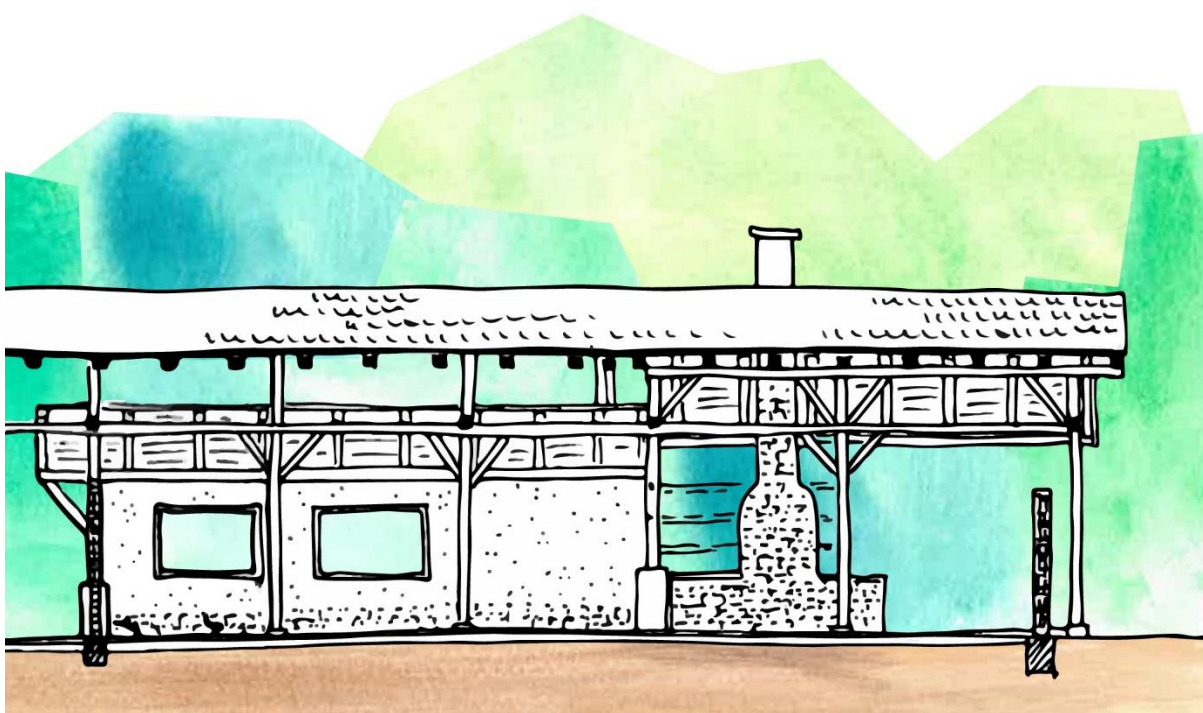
Section B of the visitor's facility, Part 2, scale 1:100
